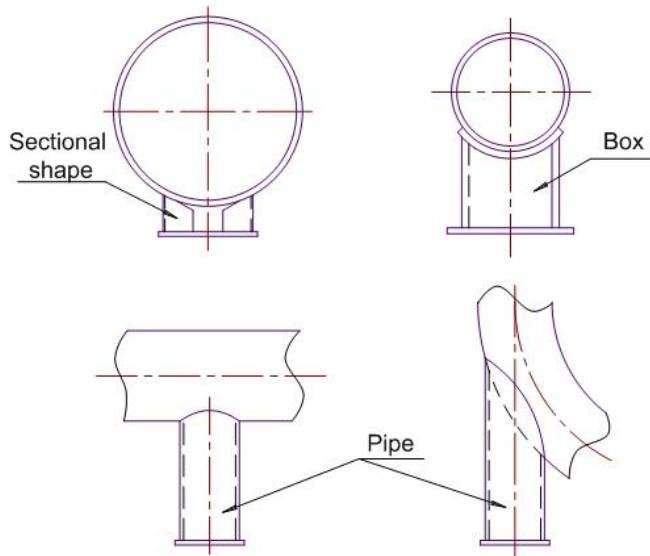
Components of weld-on supports (stanchions) for horizontal pipelines and connector bends.
